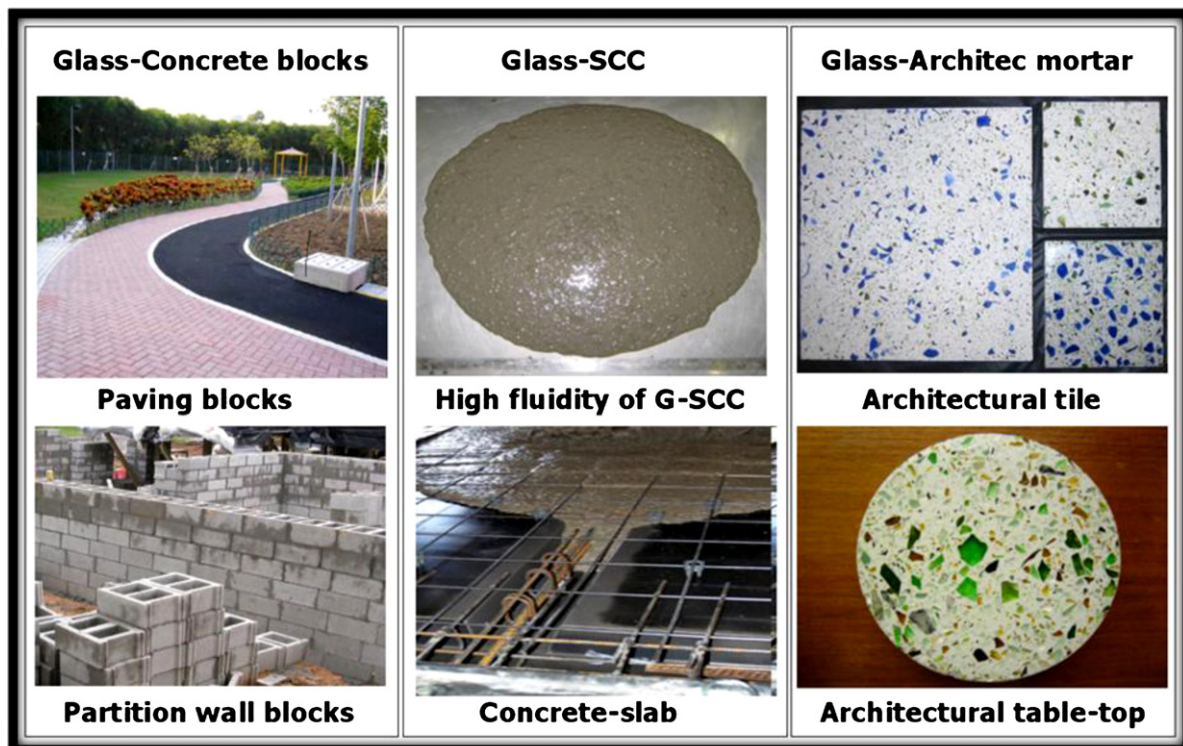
Current and potential application of developed glass-concrete products in construction industries.
